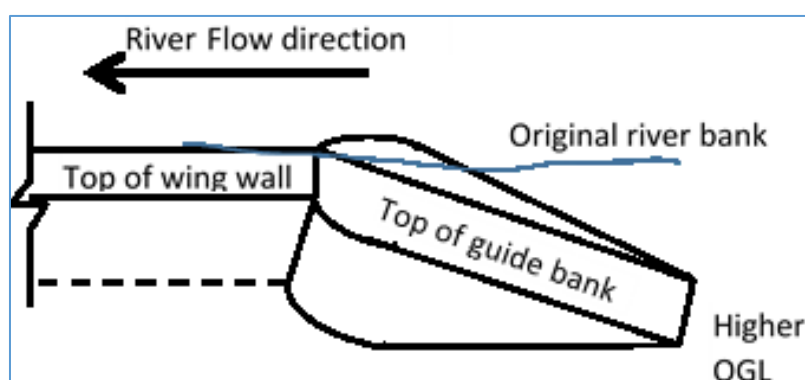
Schematic Plan of Guide Bank extended from Wing Wall
